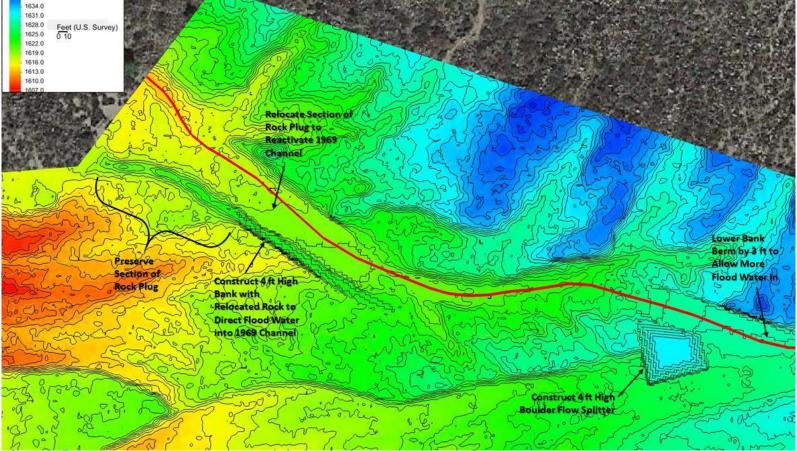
Proposed Condition Ground Elevations with 1 foot Contours from 2015 LiDAR at the 1969 Channel Inlet
